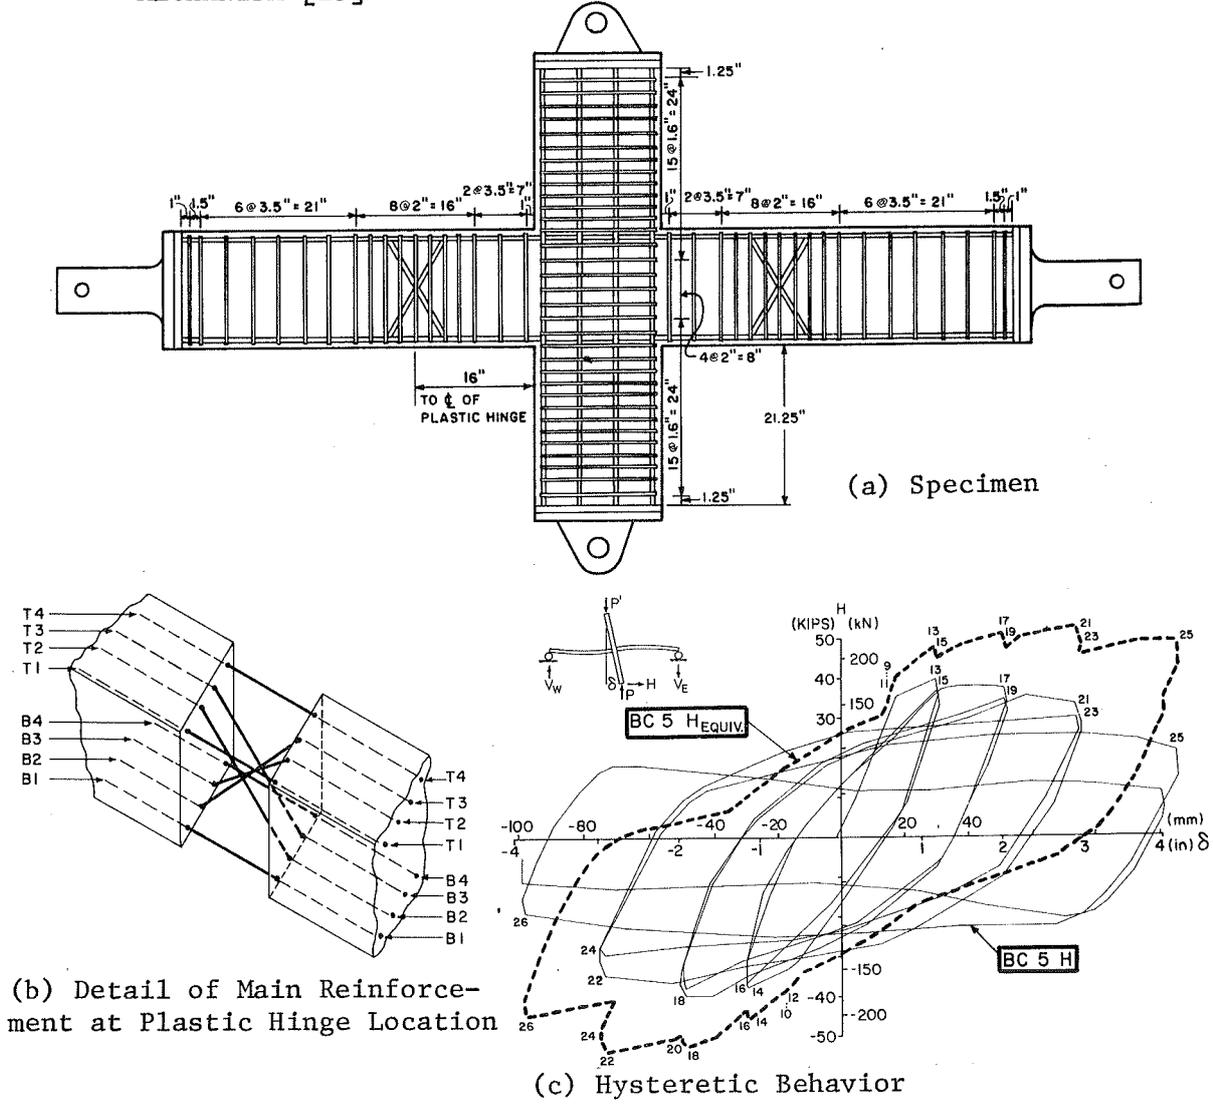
BEAM-COLUMN SUBASSEMBLAGE WITH PLASTIC HINGES FORCED AWAY FROM JOINT AND ITS HYSTERETIC BEHAVIOR [119]
